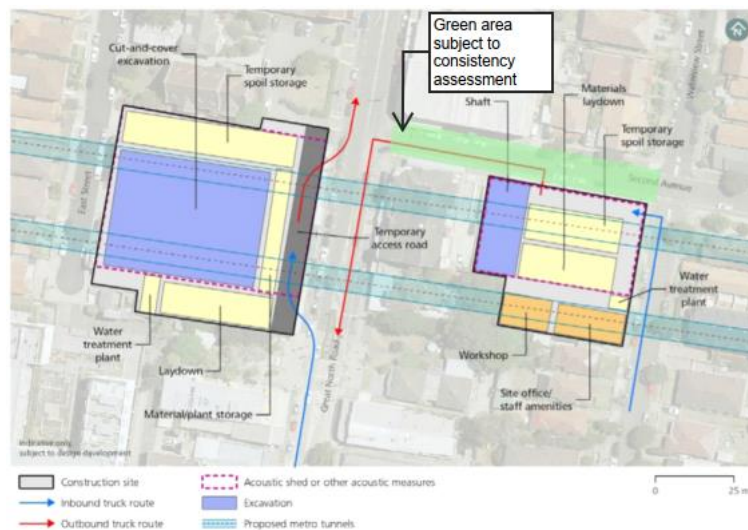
Five Dock Station indicative construction site layout (source: EIS Figure 9-28)
